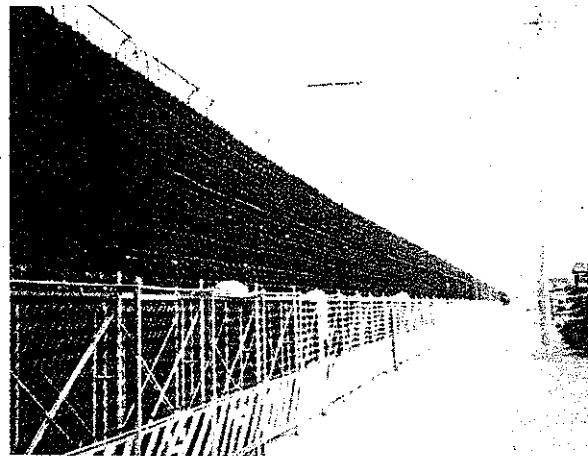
View of completed wrapped-around wall prior to placing a cast-in-place concrete facing
